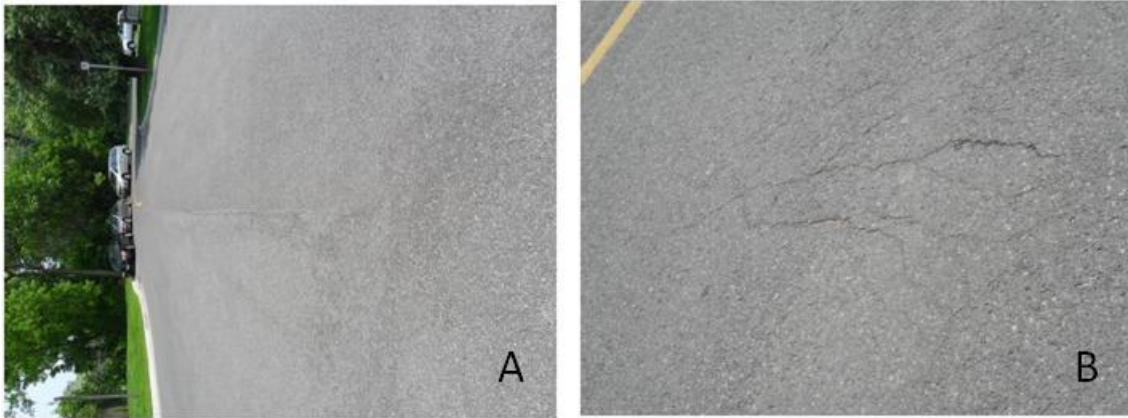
Site 3 – Longitudinal (A) and Transverse (B) Cracking
